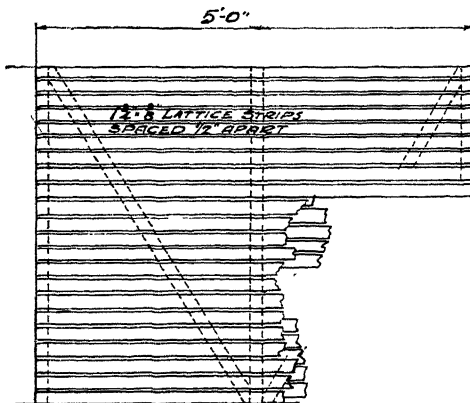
Method of constructing lattice window. The strips are nailed to a frame made of 1- by 3-inch material. If plaster lath are used, they should be nailed on the narrow way of the frame.
